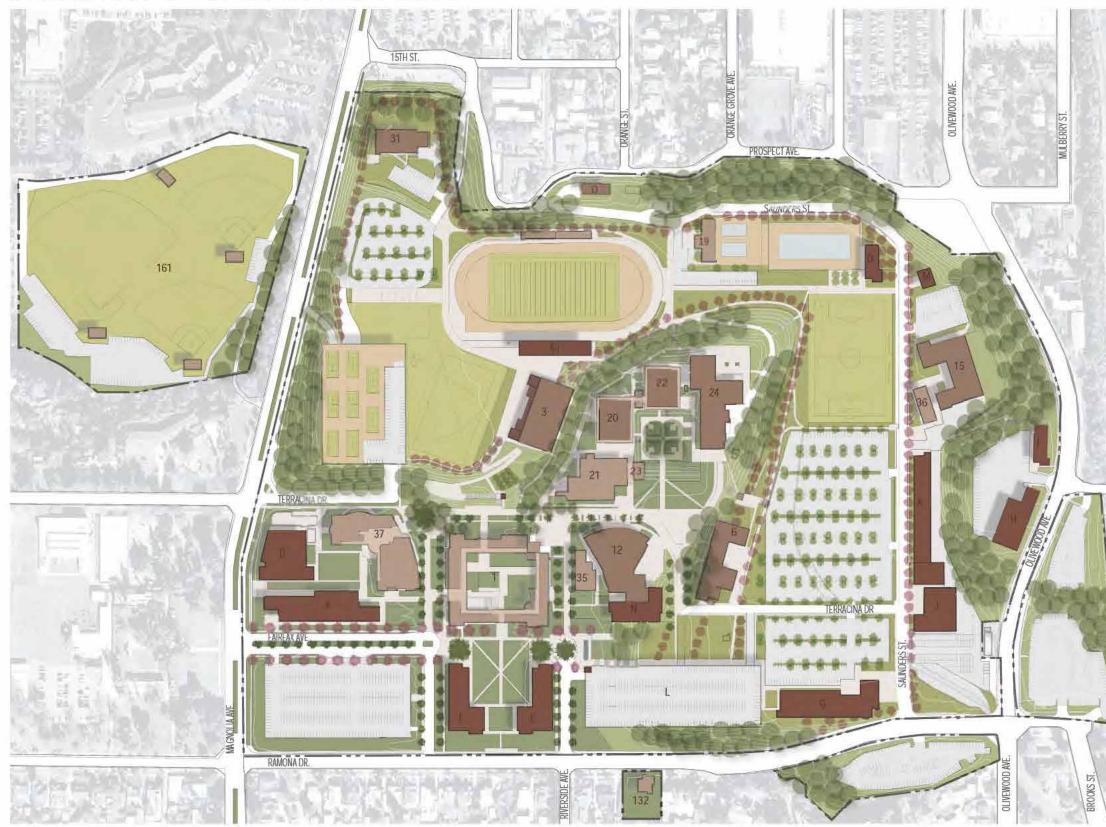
Horizon 1 - Campus Plan - Future build out
